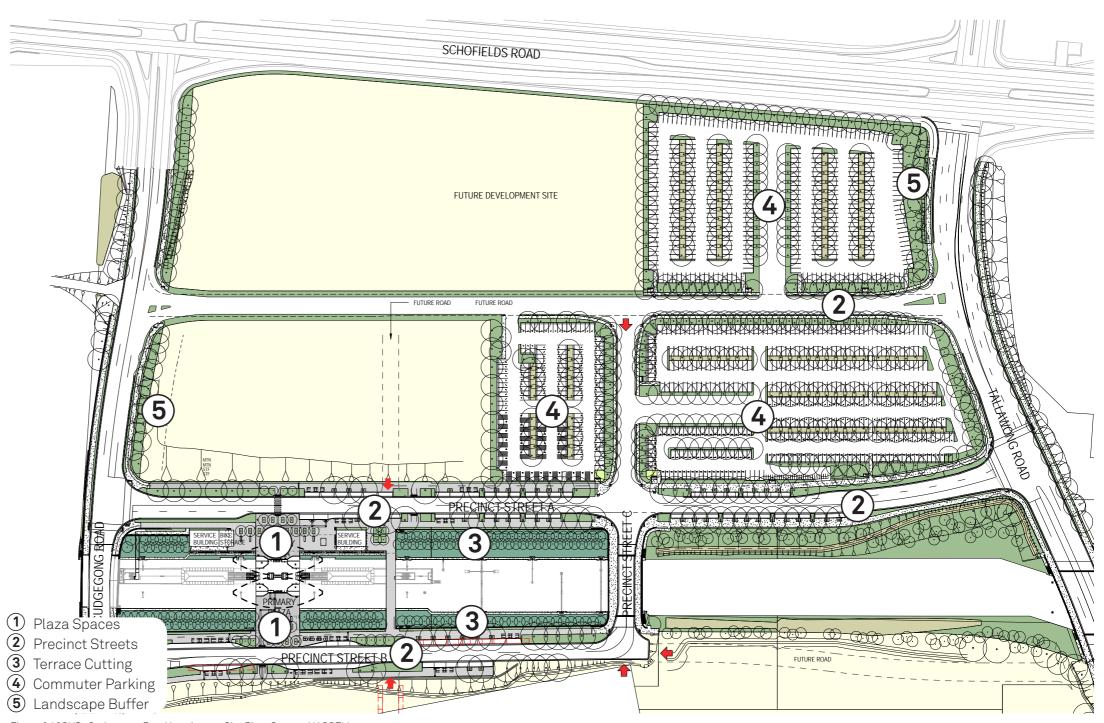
CUD\_Cudgegong Road Landscape Site Plan. Source: HASSELL.
